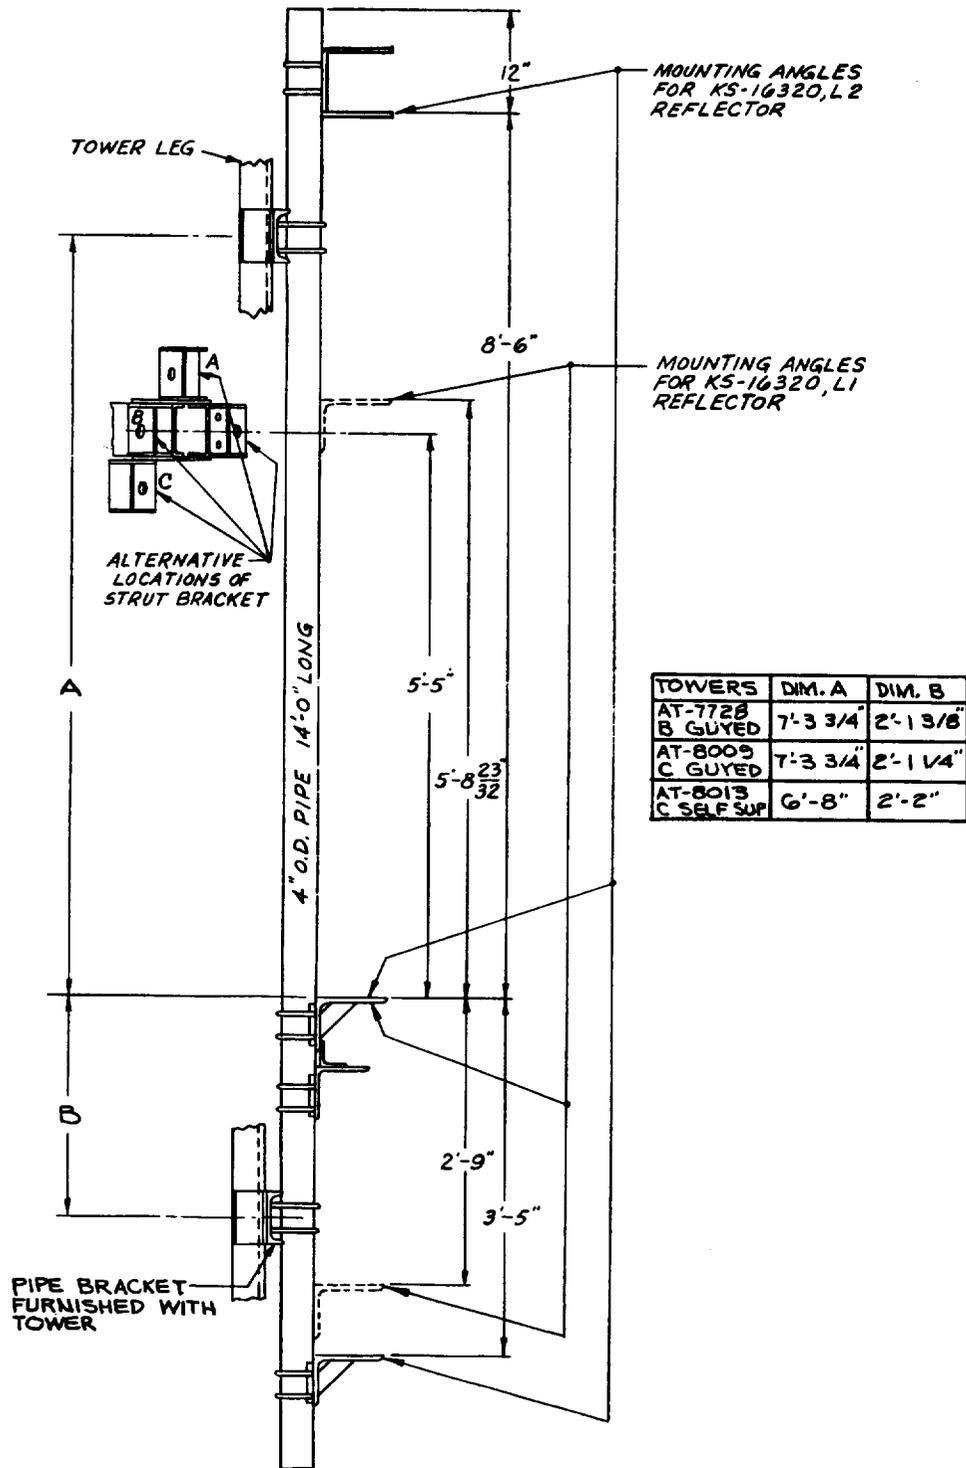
KS-16320 Pipe Mount on AT-7728 B Guyed Tower, AT-8009 C Guyed Tower, and AT-8013 C Self-Supporting Tower
